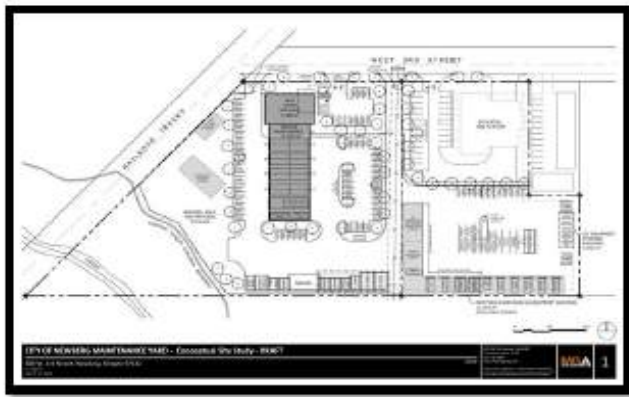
CONCEPTUAL PUBIC WORKS MAINTENANCE YARD PLAN
